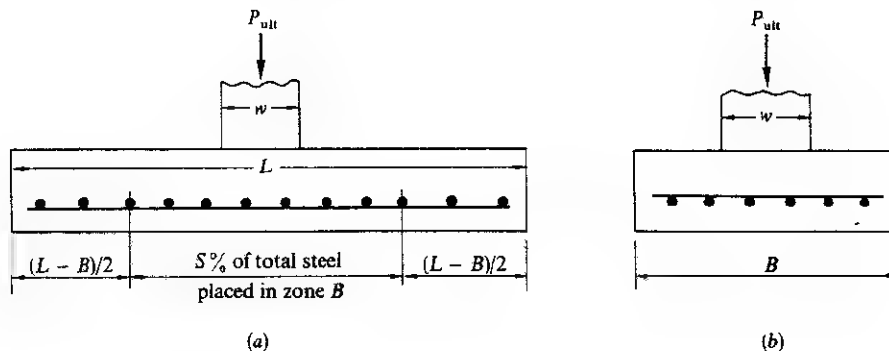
Rectangular-footing steel requirements for short side (ACI, art. 15.4.4). (a) Place half of remaining steel in each zone; if inadequate for shrinkage, use the amount to satisfy shrinkage requirements. (b) Note longitudinal steel on bottom for greater efficiency.
